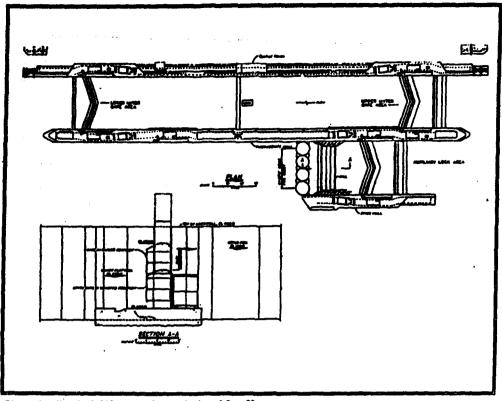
Vertical lift gate plan at Lock and Dam 20.
